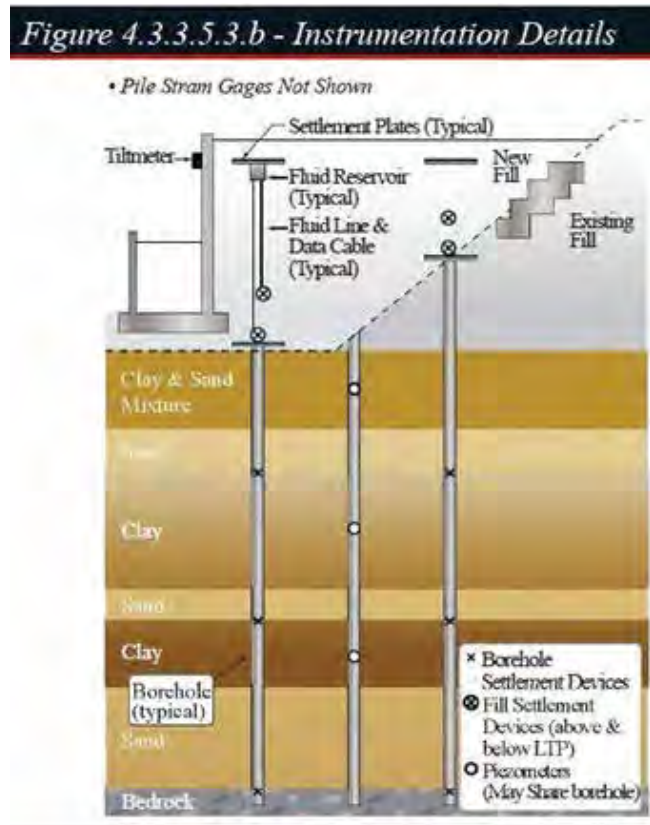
Detail of the Hastings Bridge continuous settlement monitoring instrumentation (Behnke and Ames 2010).
